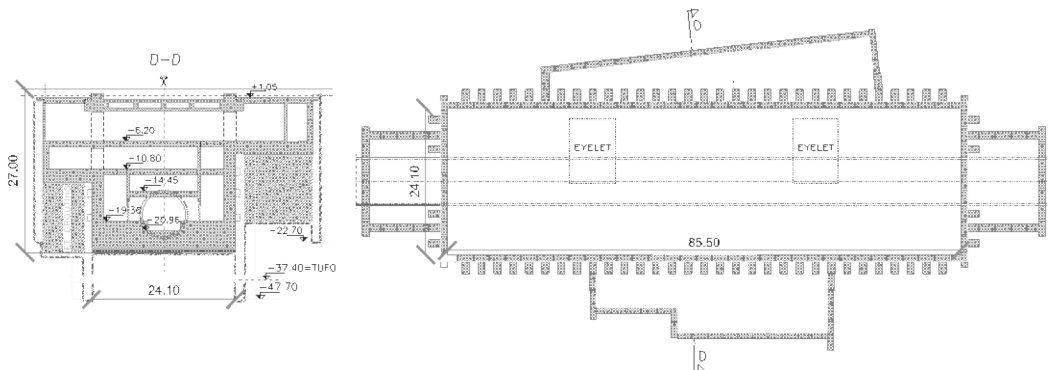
Plan view and transverse vertical section of the San Pasquale Station
